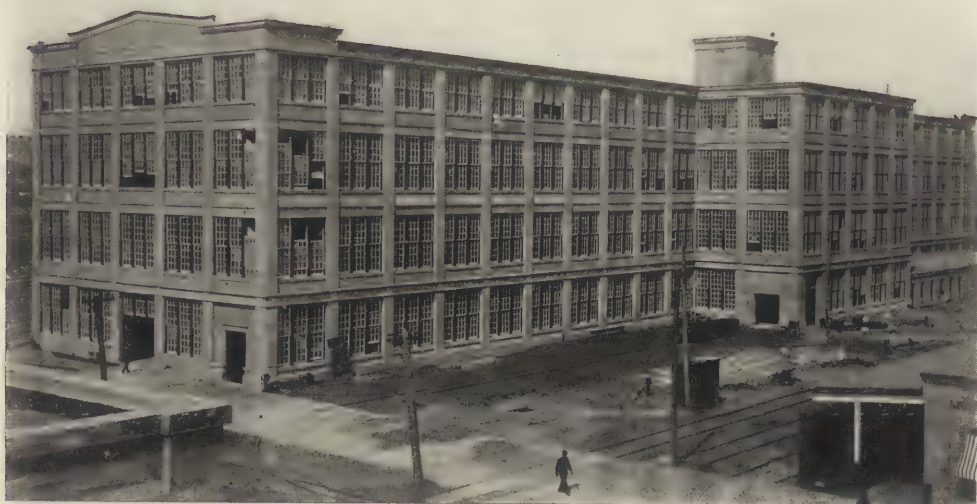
A REINFORCED CONCRETE FACTORY BUILDING.
